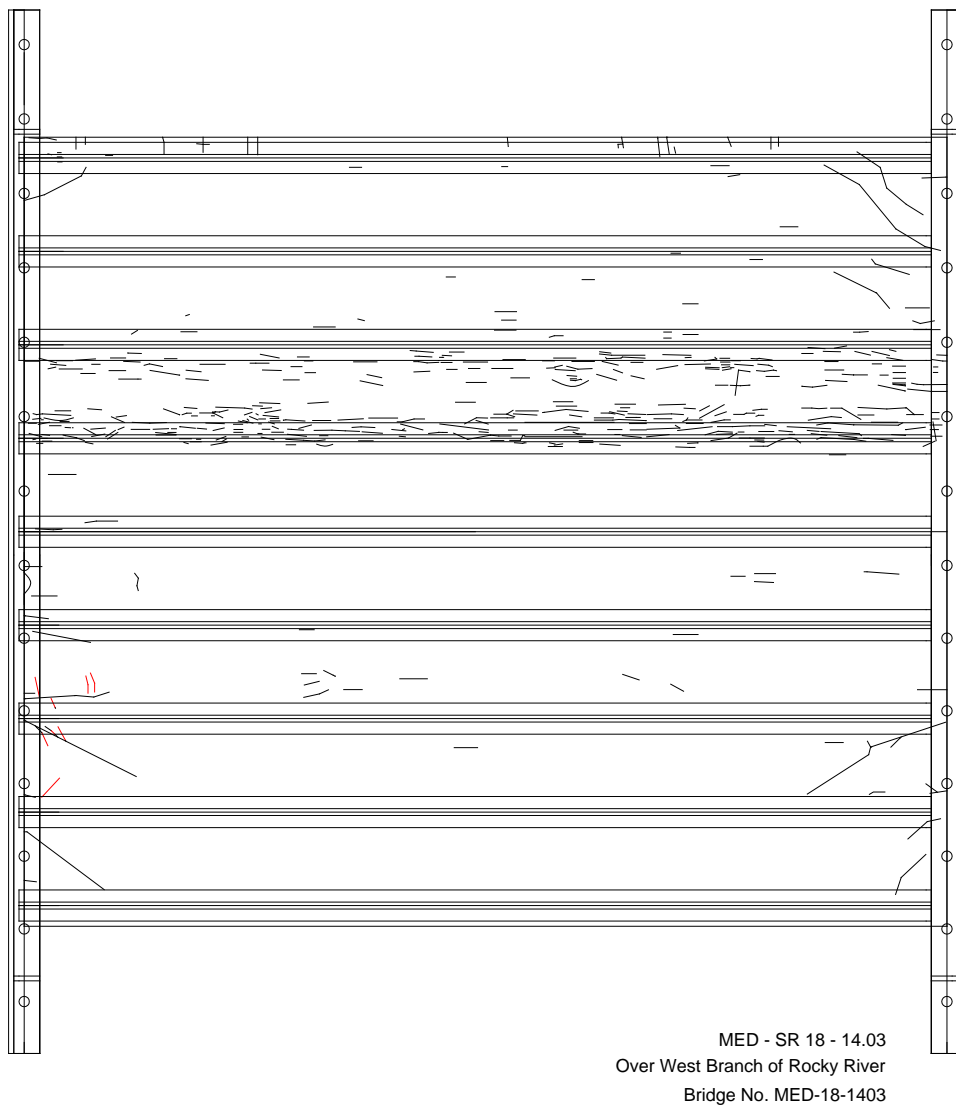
Crack map interposed with structural layout for Bridge Number MED-18-1403
